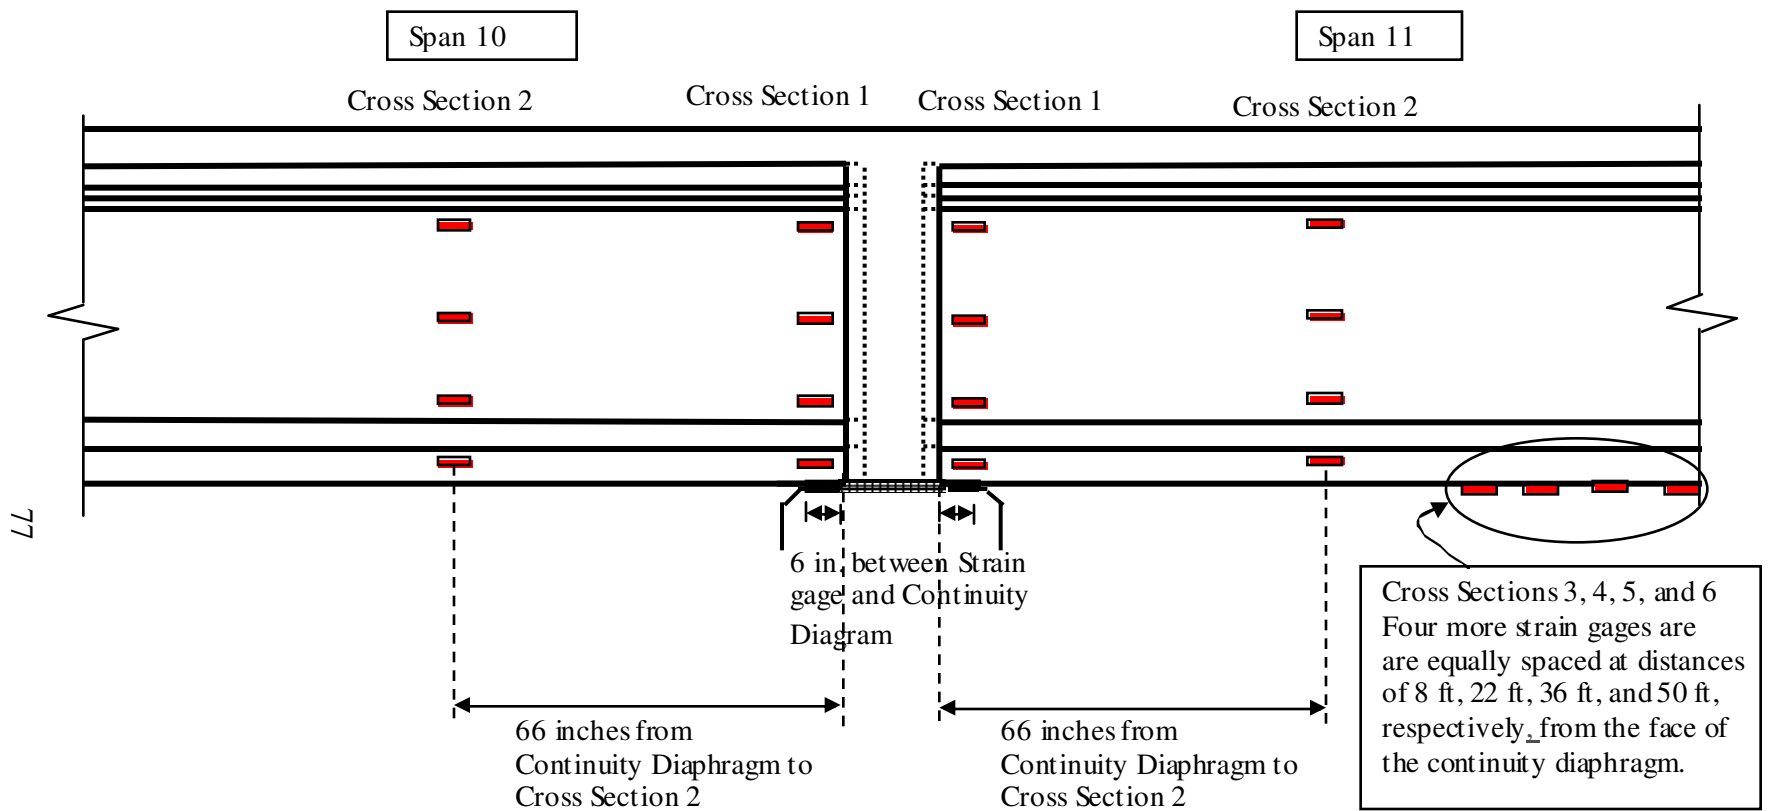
Strain Gage Instrumented Cross Sections for Girders 7 and 8
